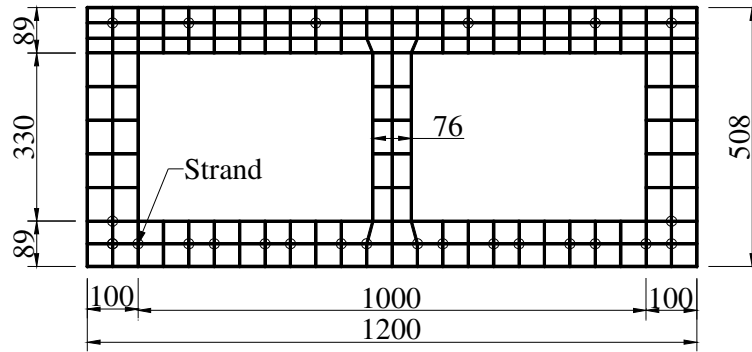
Transverse cross section of the finite element model of the girder (dimensions in mm).
